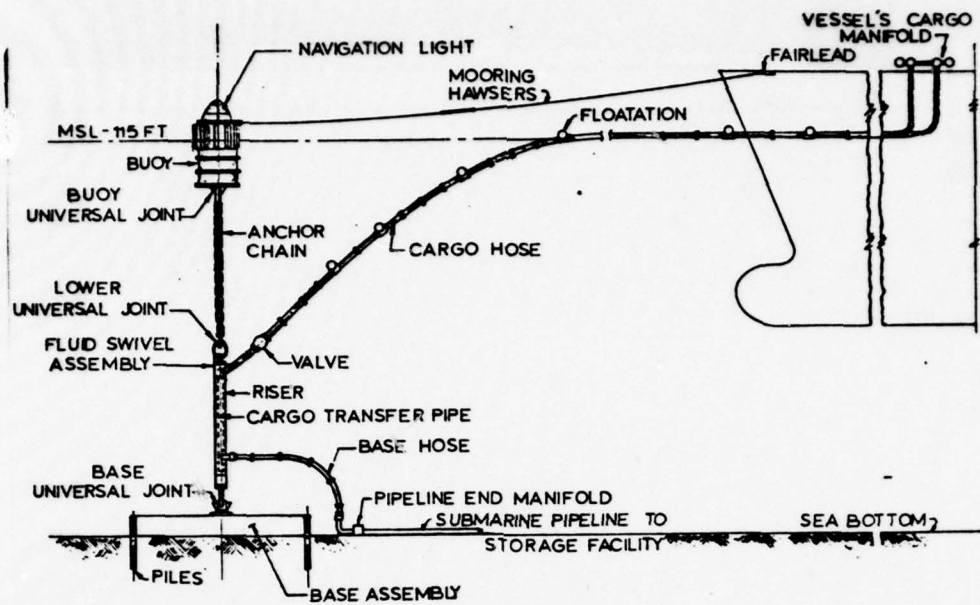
SINGLE ANCHOR LEG MOORING (SALM)
